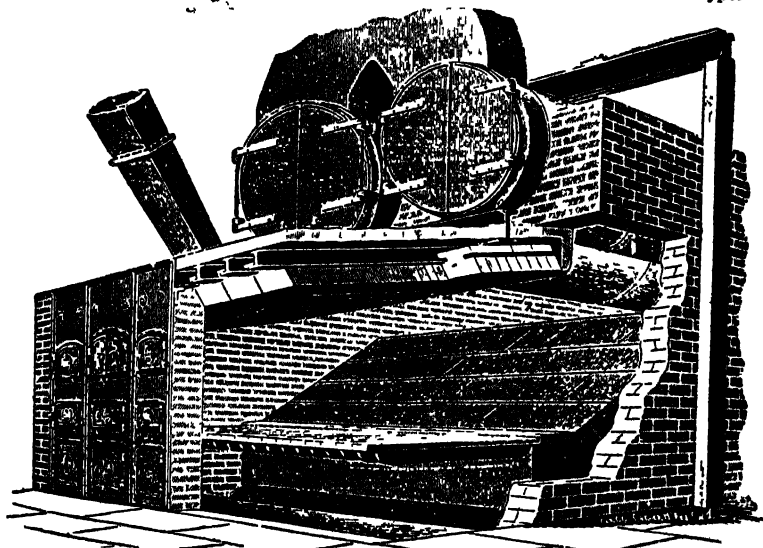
,407.—Quinn's flat top Dutch oven furnace setting (Walsh and Weidner). *This type of furnace is especially fitted for Dutch ovens burning damp or bulky fuel. There are two layers of tile with the air space between for cooling the suspension beams and the tile.
